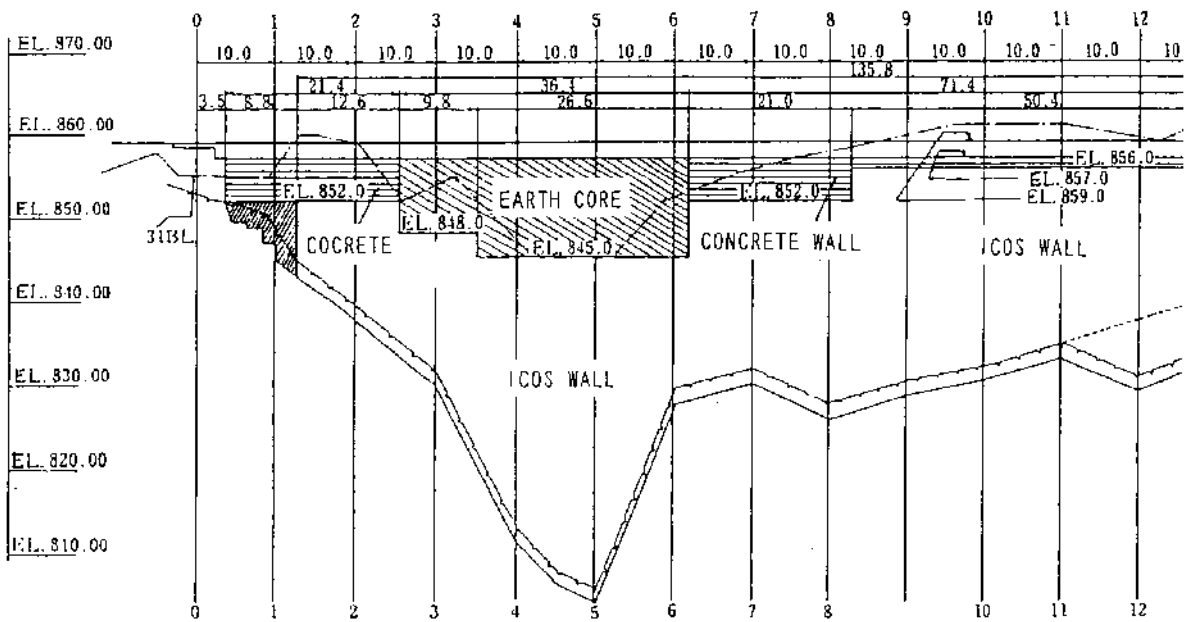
Longitudinal section along part of ICOS cutoff wall showing location of earth core section flanked by concrete walls on either side
